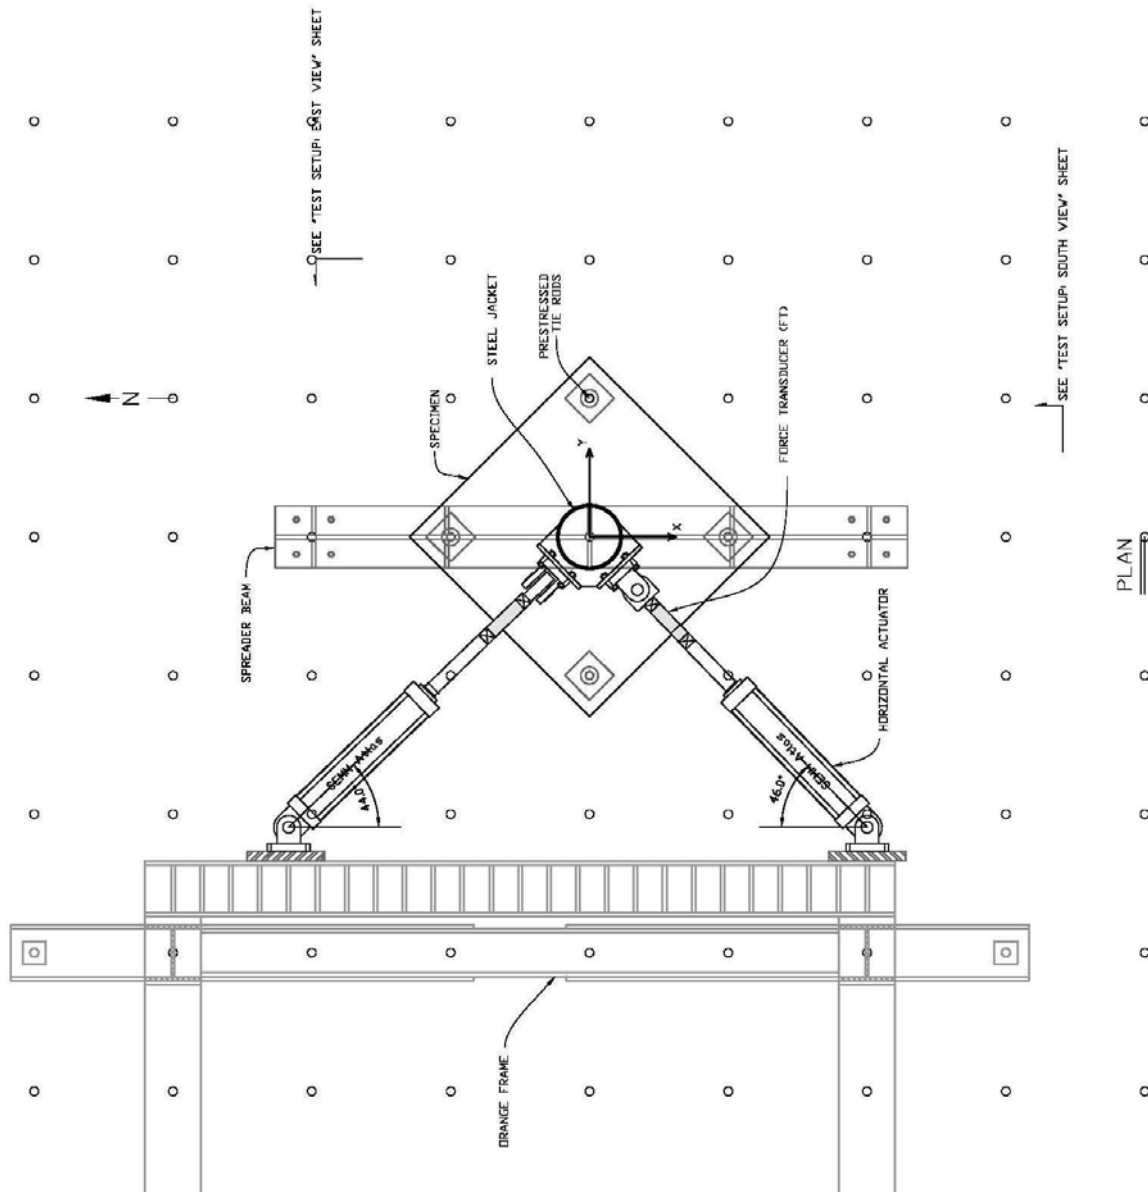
Plan view of experimental setup of FRC column specimen subjected to bidirectional cyclic loading
